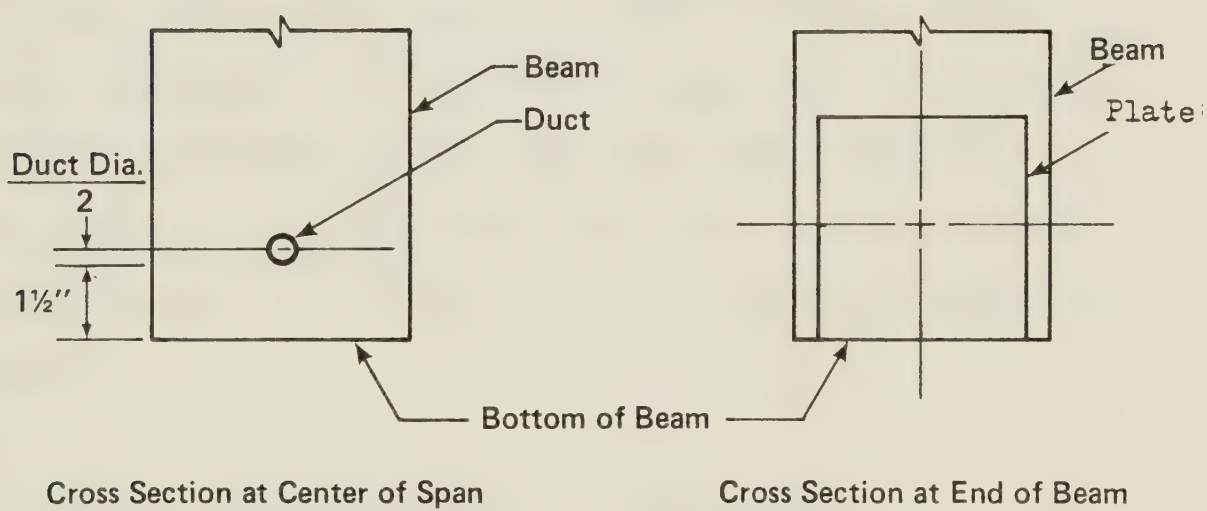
Reinforcement and End Plate Location in Post-tensioned Beam
